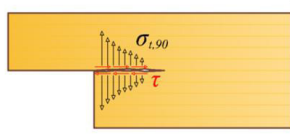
Crack opening and stress concentration at the notched end of a beam.
